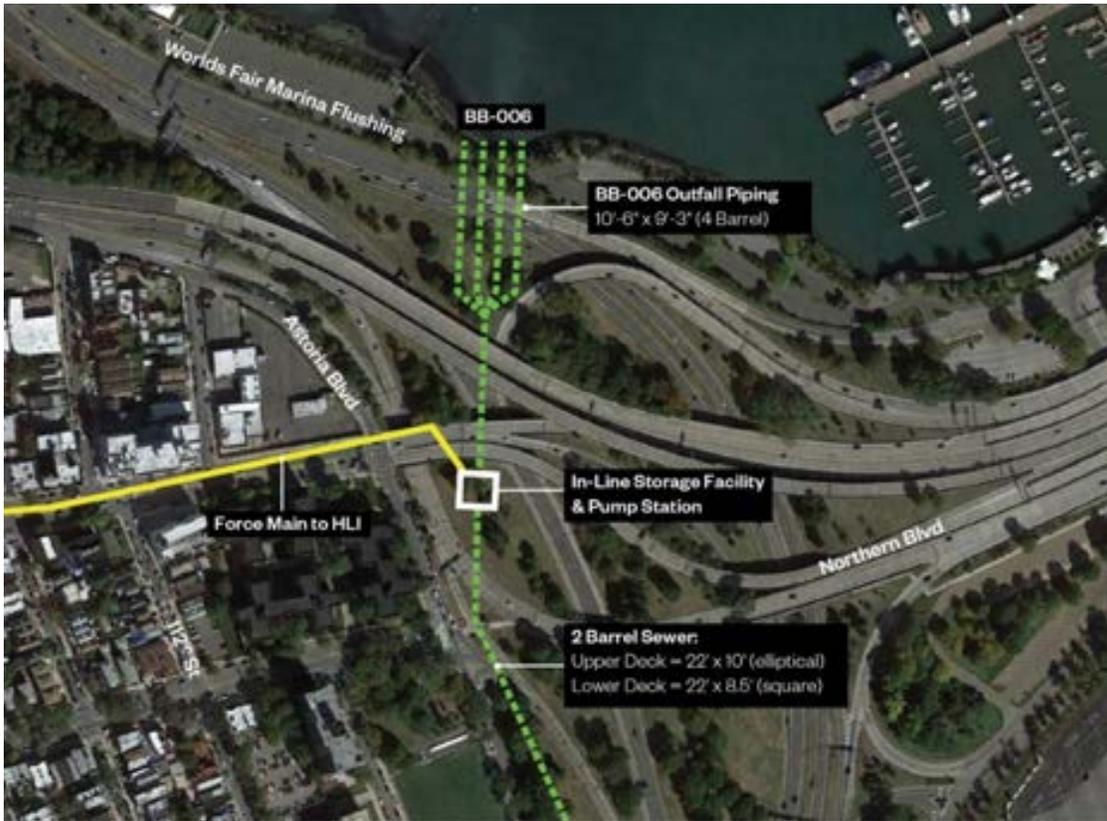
Layout of Alternative 9-3 – Outfall Storage for BB-006
